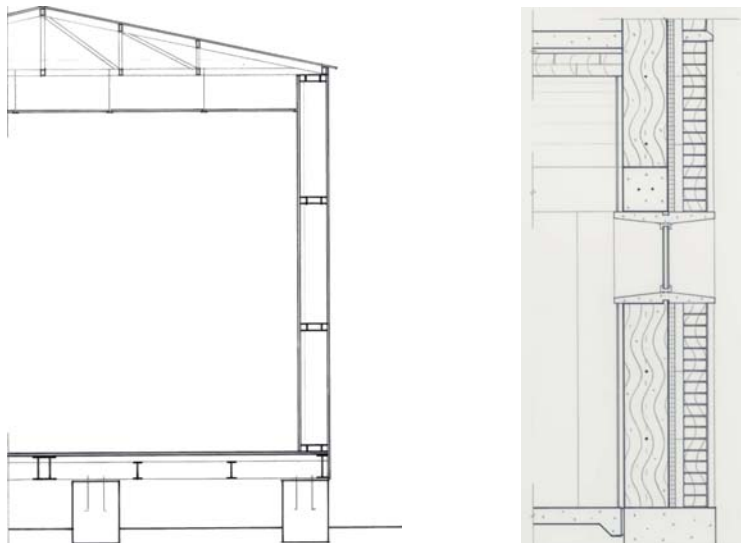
Building Systems. The prefabricated metal building and monolithic earth wall building systems were the subject of comparative analysis in this research.
